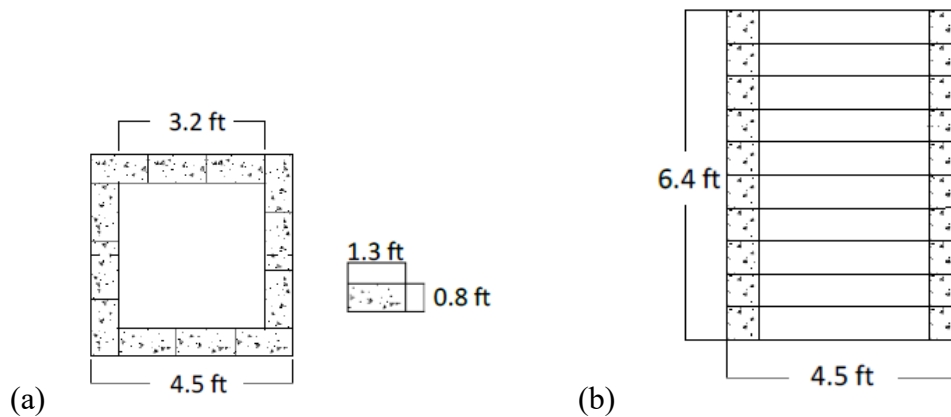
Schematic for the Defiance County (DC) mini-pier: (a) plan view; (b) elevation view (Nicks et al. 2013 – FHWA-HRT-13-066).
